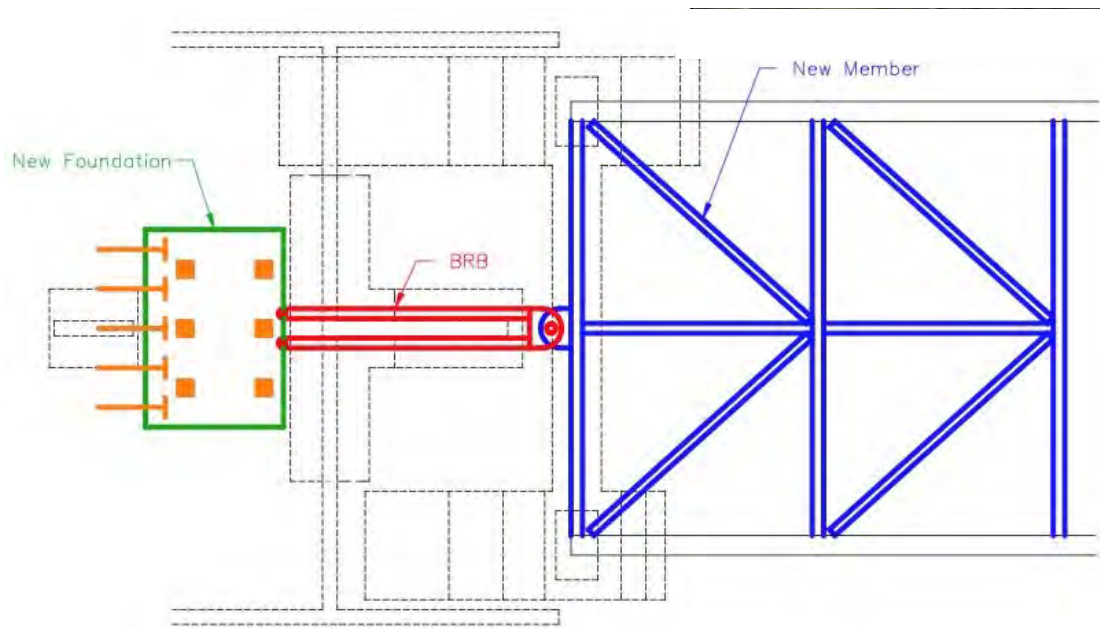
Plan View of installed BRB at location 1 (Reno and Pohll, 2010b)
